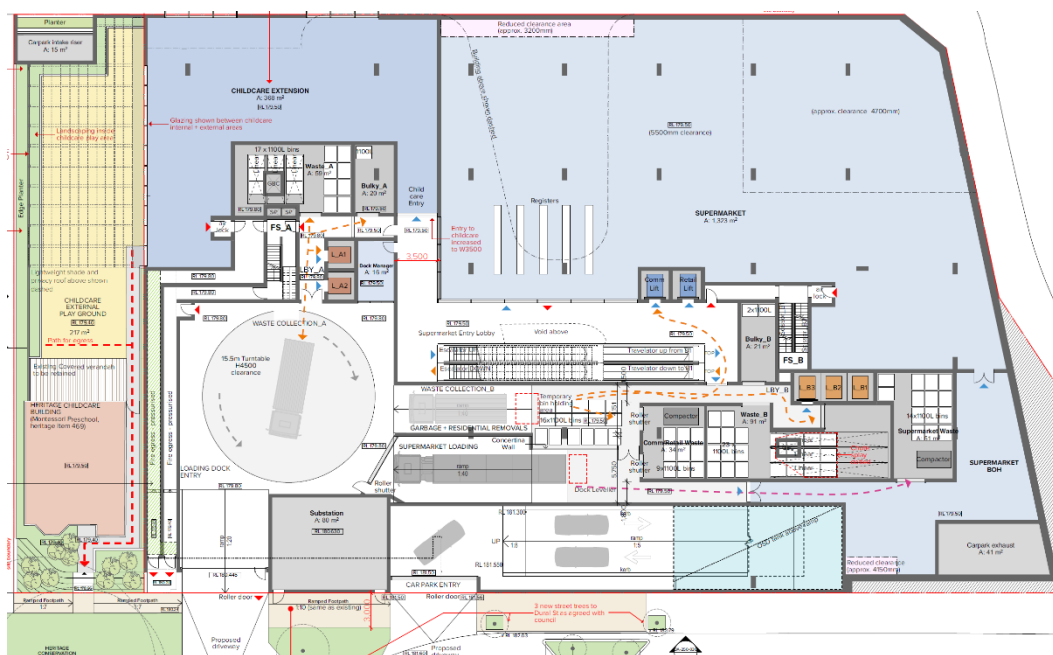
Extract of the Lower Ground Floor plan (Source: Turner Architects)
